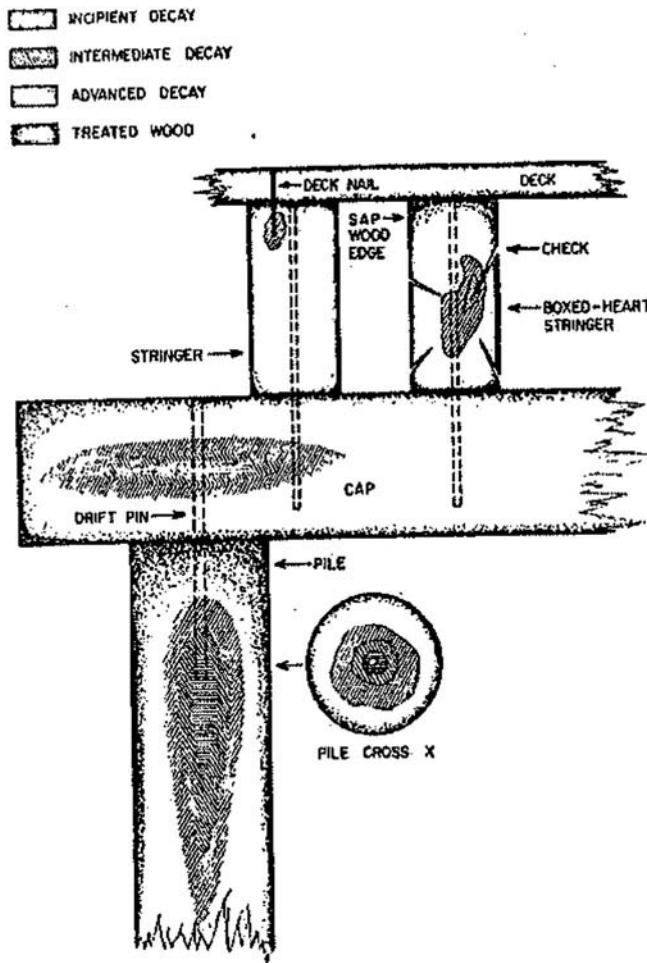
Schematic illustration of typical locations of decay damage on timber pile bent
